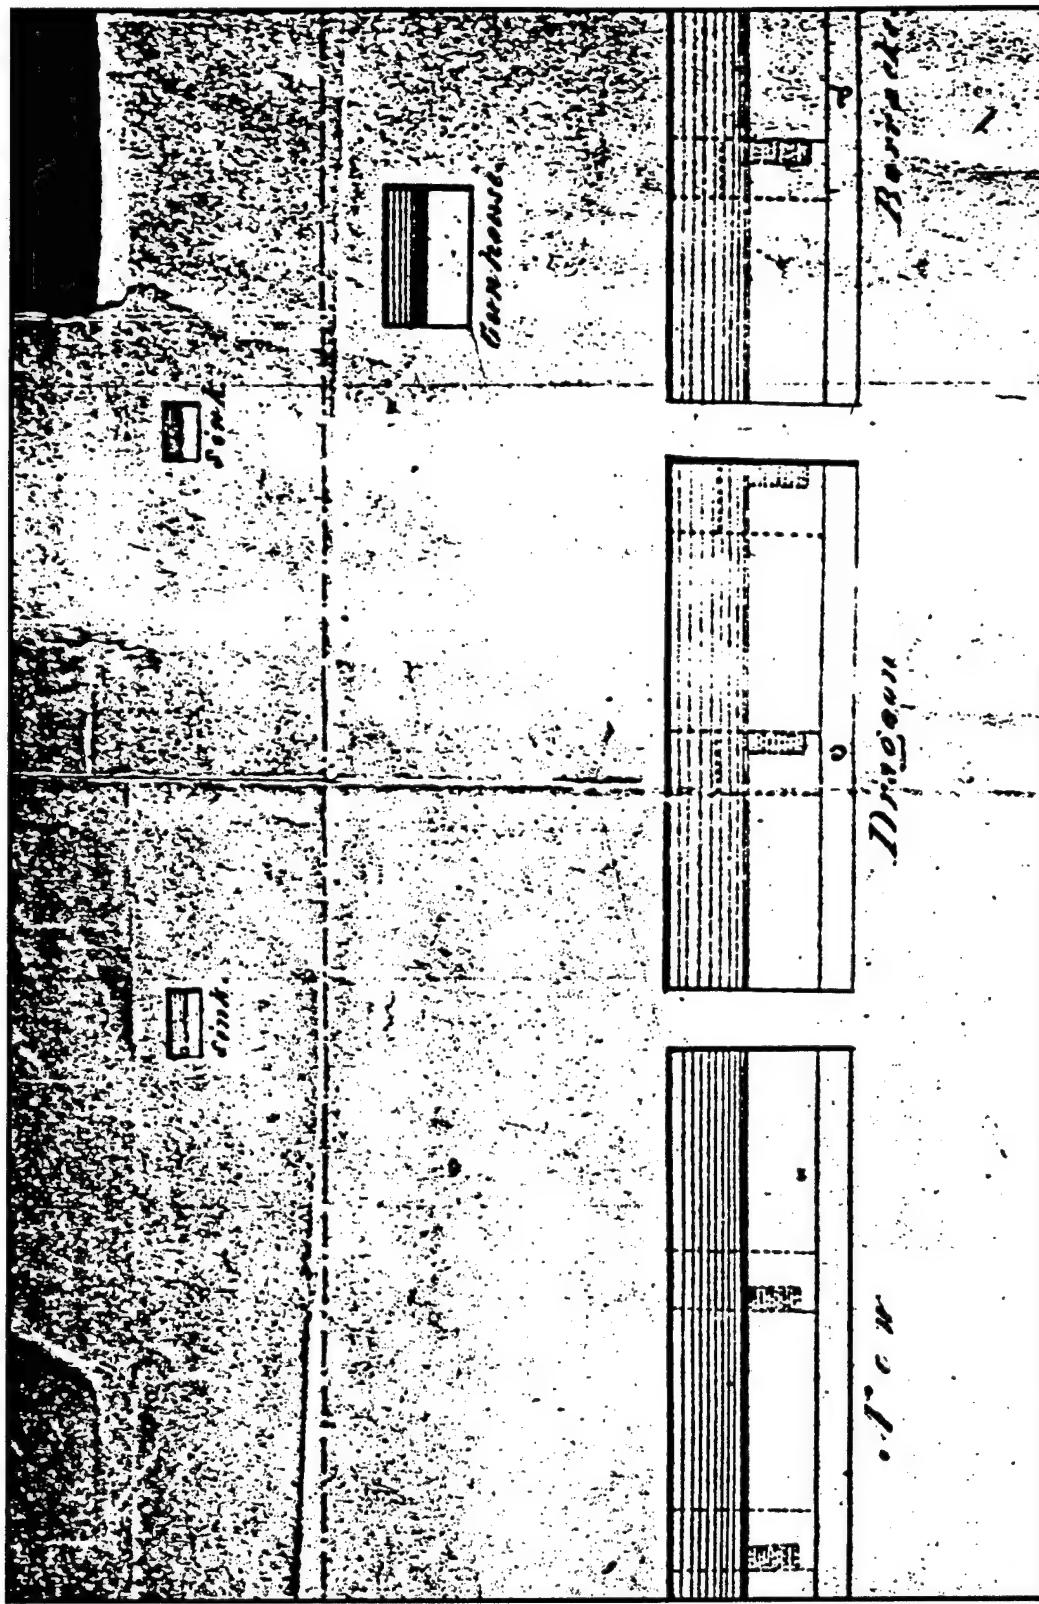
Late 1830's map of southeast corner of Main Parade showing "New Dragoon Barracks", gun house, and sinks.
